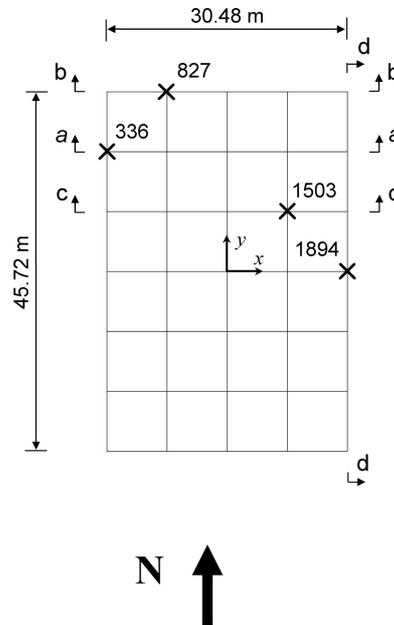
Plan view of building with locations of members and cross sections of Fig. 2
